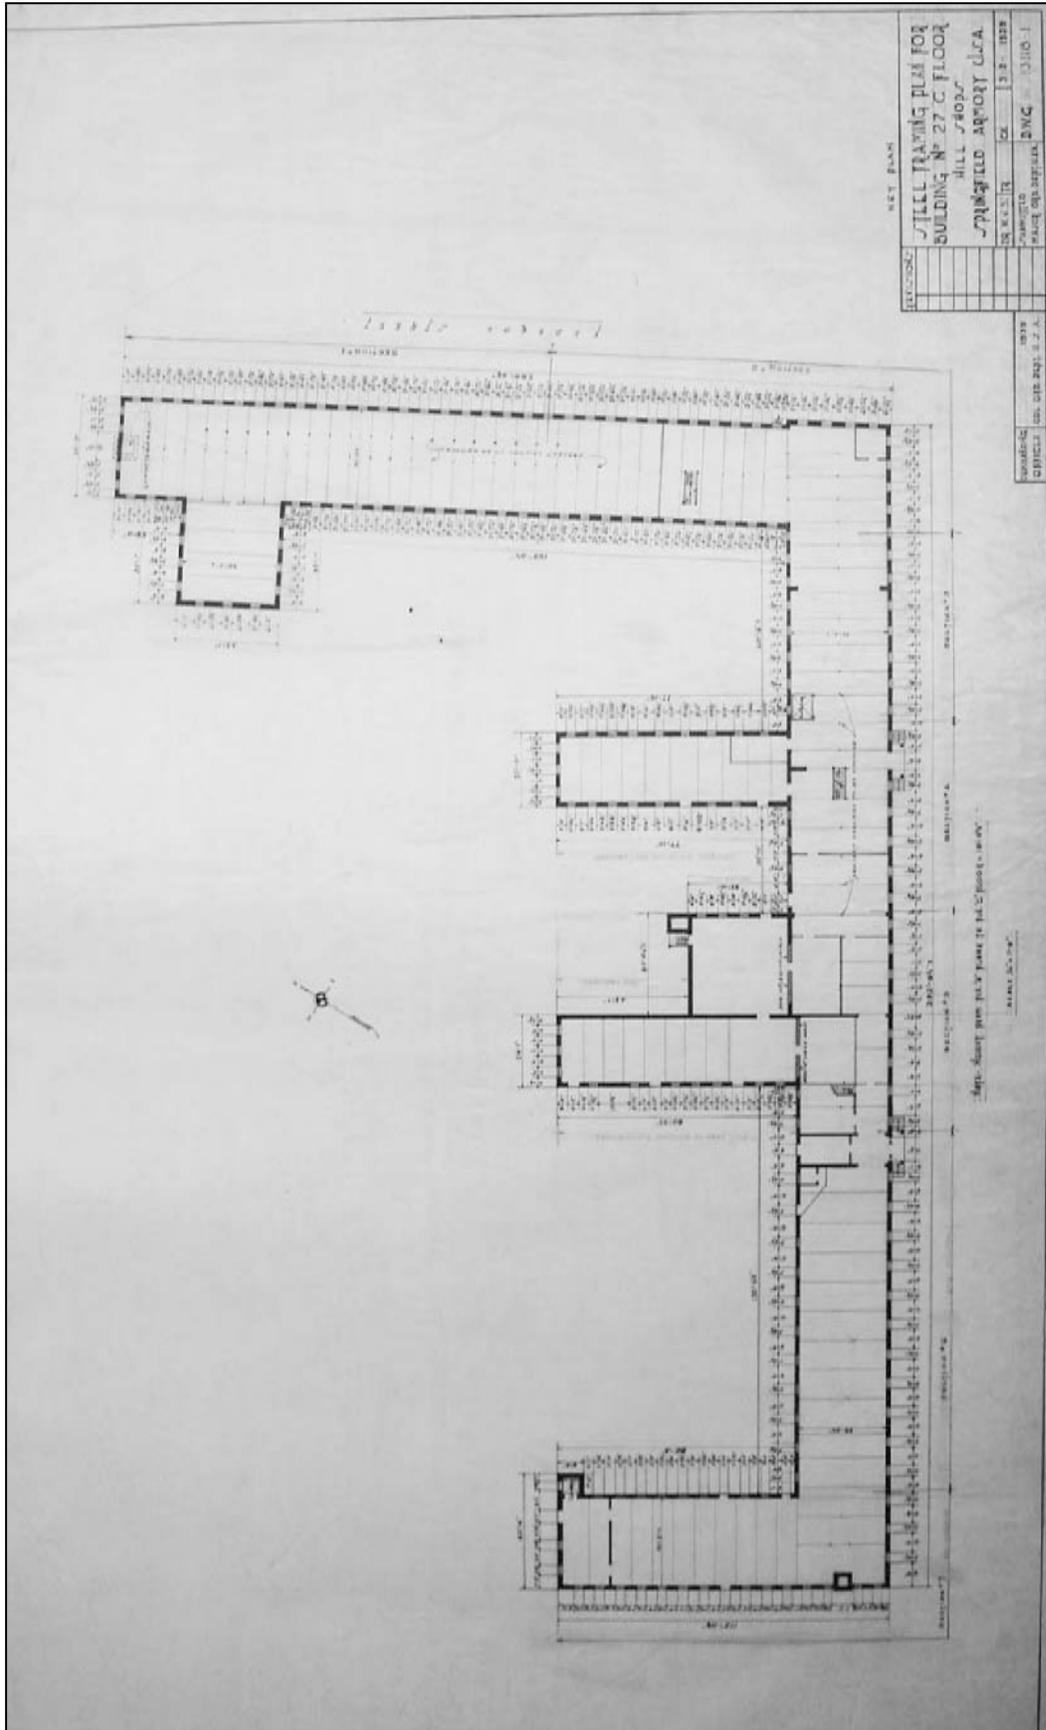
Steel Framing Plan for Building No. 27, "C" Floor, Hill Shops, Springfield Armory, U.S.A., March 8, 1939; not to scale. The framing shown was installed at the ceiling level of the first story to support the second story ("C" floor).
